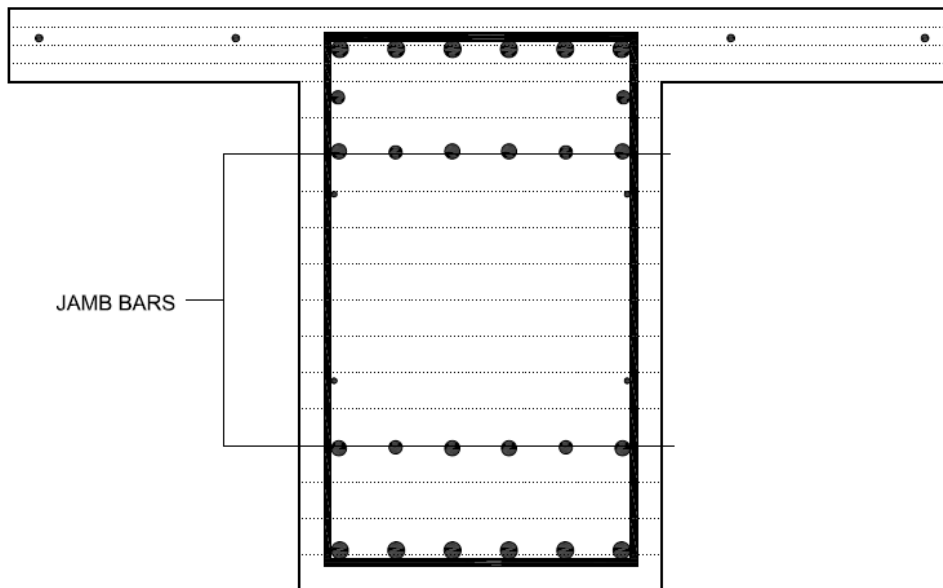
Cross Section for Specimen 1 at Elements 2,3,4,5 and 6.
